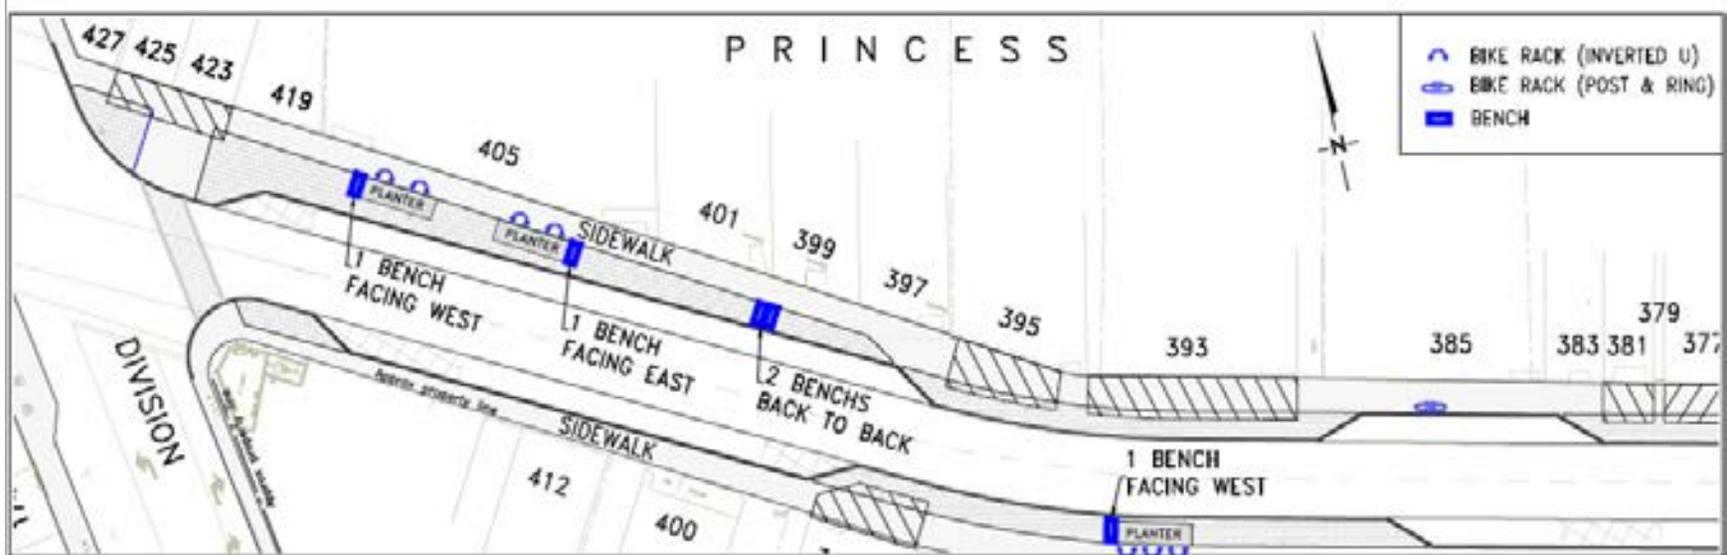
Bench and Bicycle Rack Placement on Princess Street from Division Street east to 383 Princess Street
